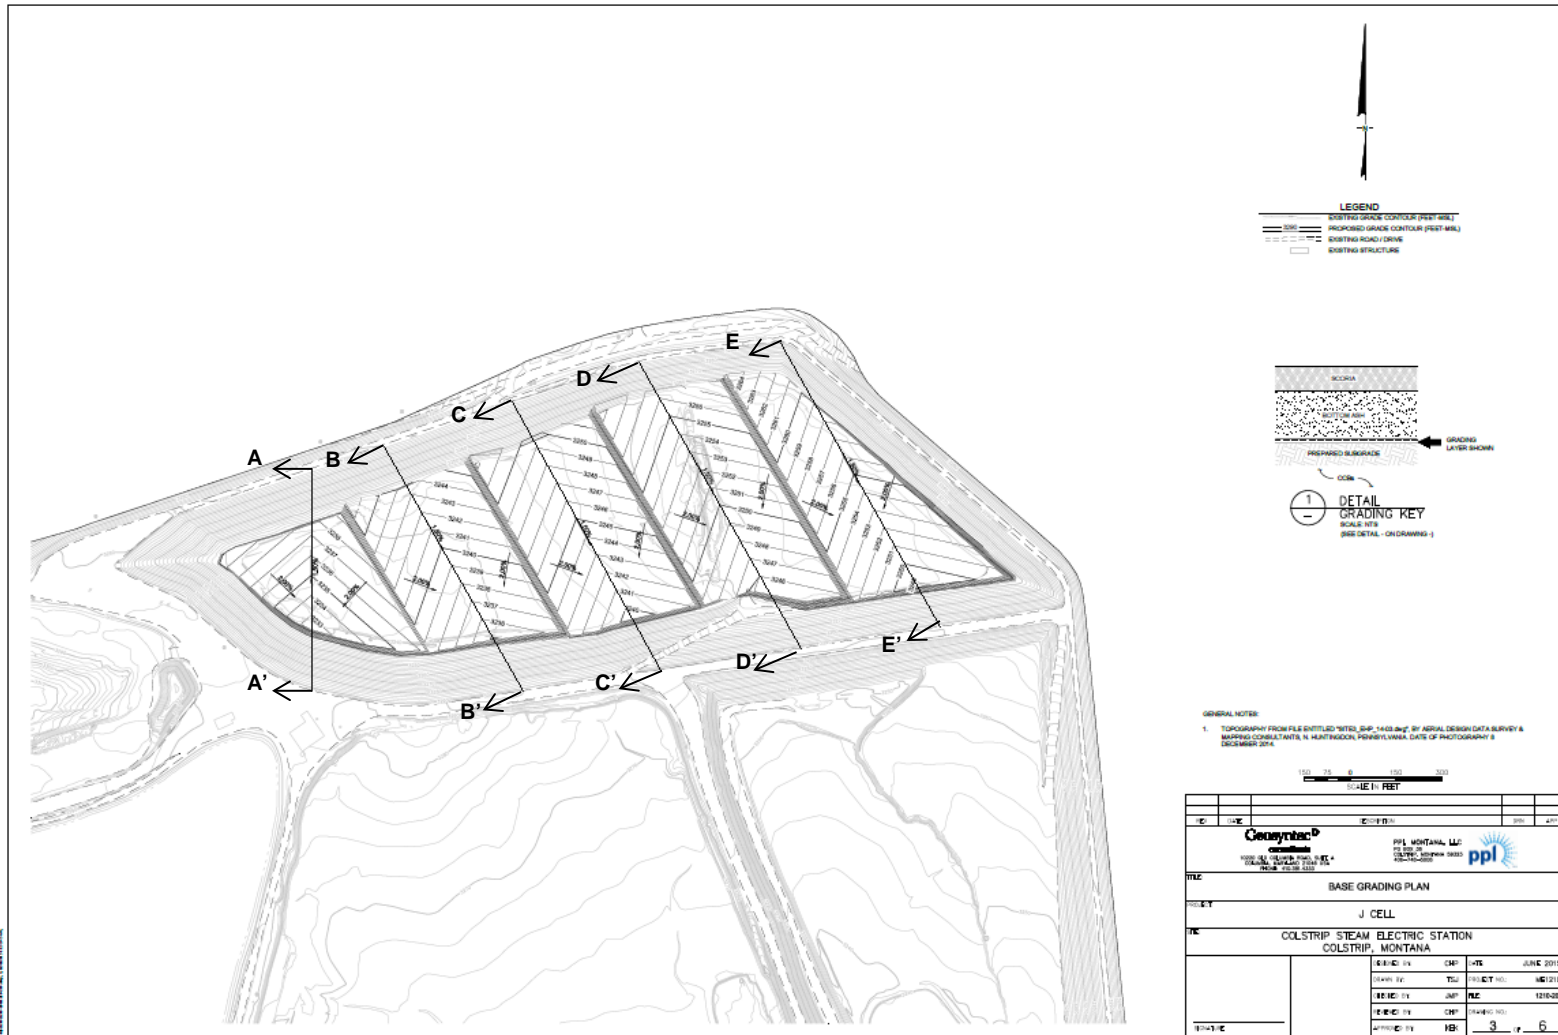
Location of Critical Cross Sections shown on the Top of Liner Grading Plan
